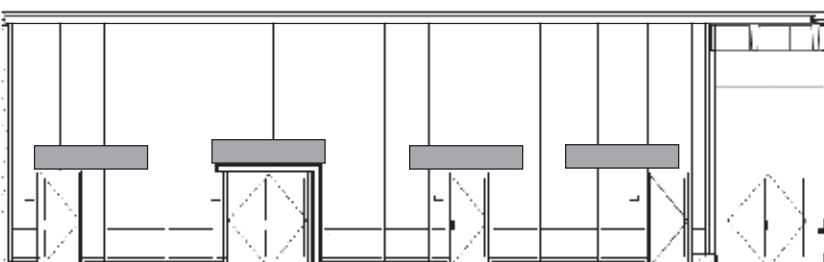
TYPICAL CONCEPT ELEVATION - RETAIL WALL SIGN
